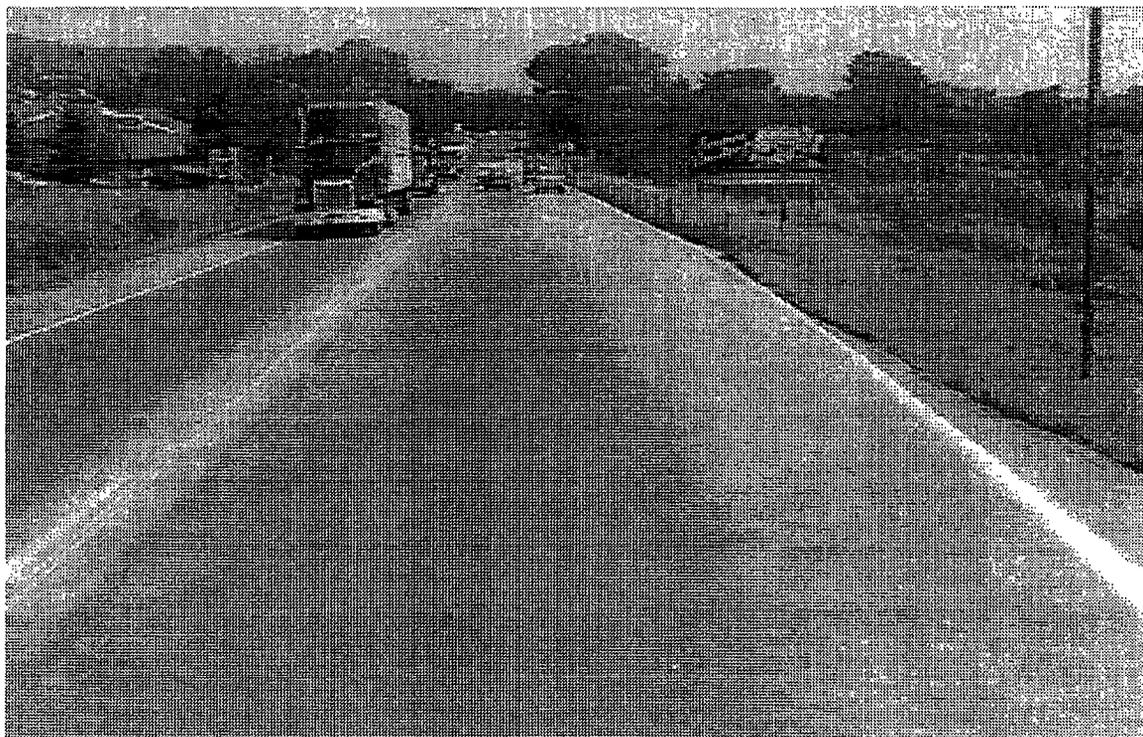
Photograph of a second T-intersection site with a bypass lane.
